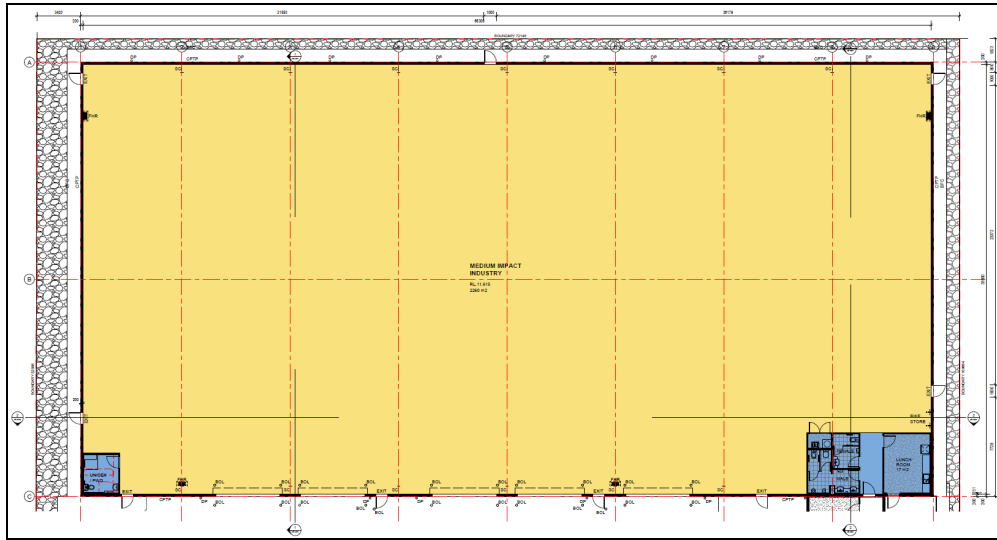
Warehouse Plan (Source: Multi Span Australia Design Construct)
